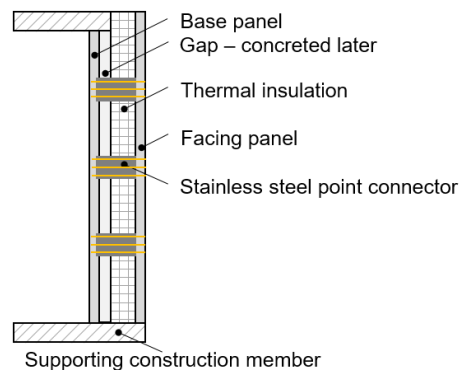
Cross section of a sandwich wall, assembled with stainless-steel point connectors; with gap between thermal insulation layer and base panel
